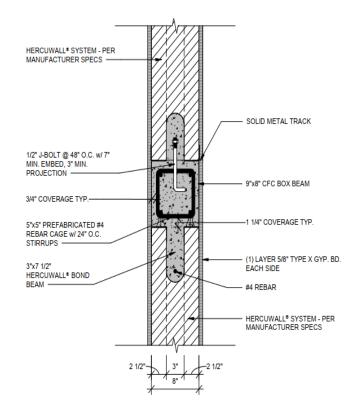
1-hr Load-Bearing Unbraced CFC Box Beam Wall
